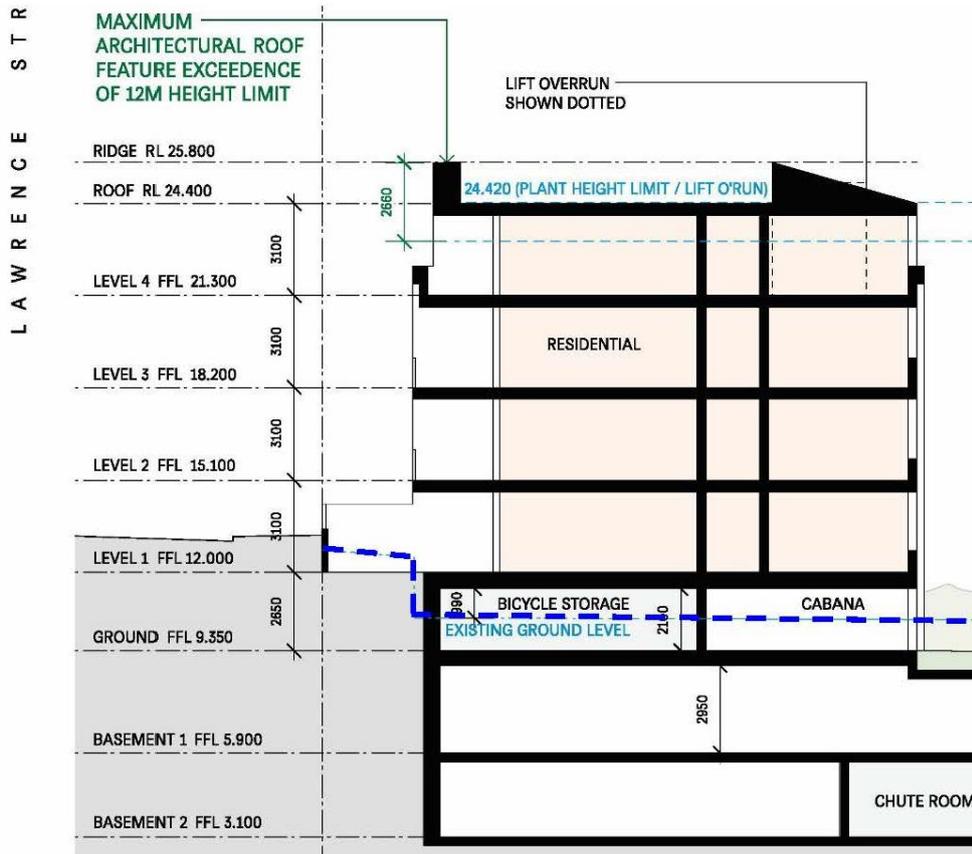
Section B amended proposal - Lawrence Street below ground apartments
